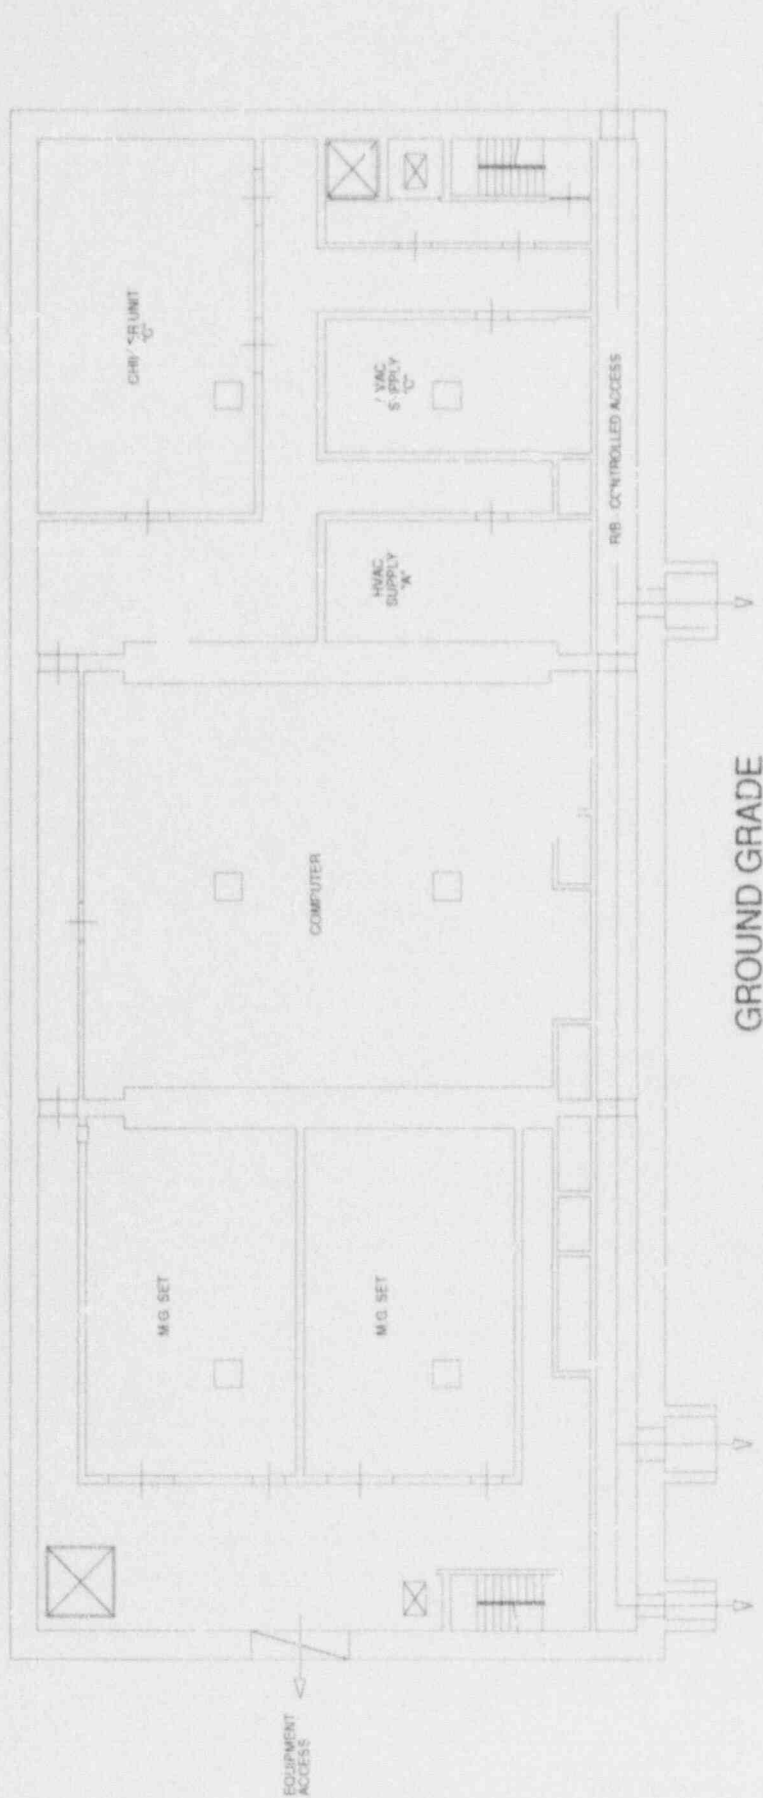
CONTROL BUILDING FLOOR B1F
